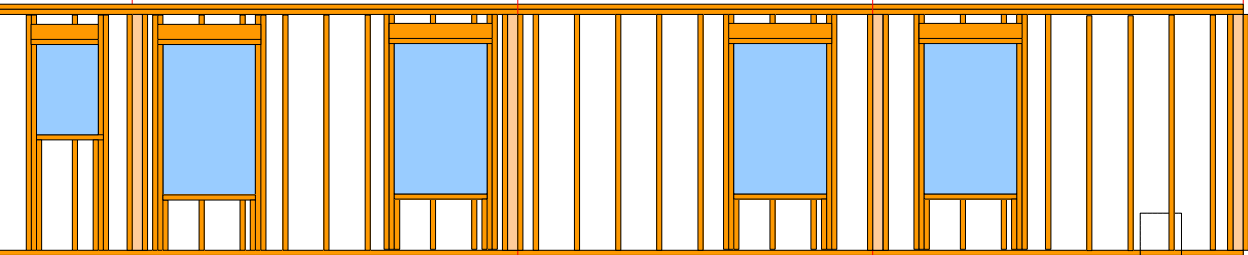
Elevation of Exterior Wall "F" at Construction Site 1
